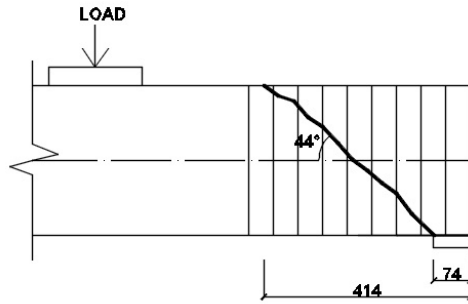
S1-C prestressed concrete hollow-core slab at failure. Note: 1 kN = 0.225 kip.
